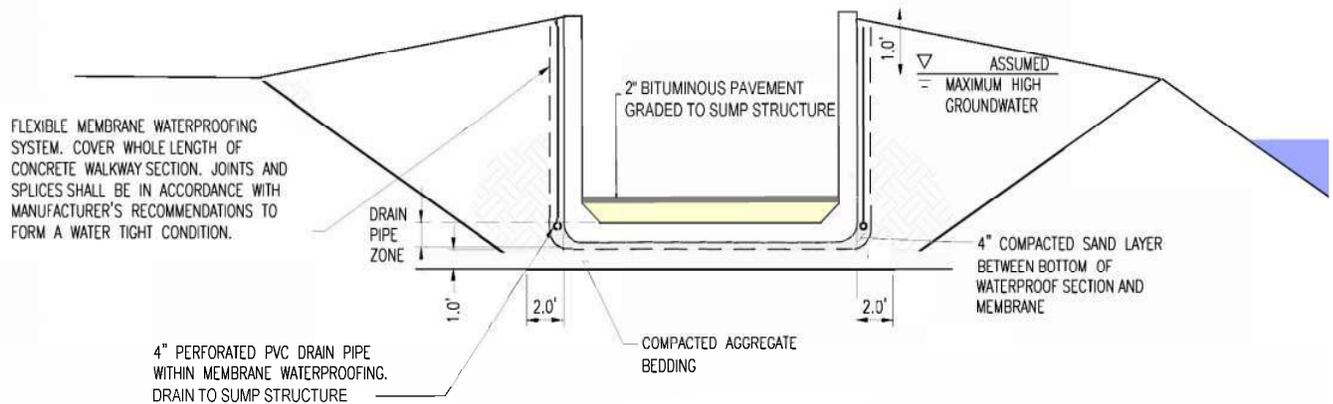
VE Proposed Depressed Trail Section Beneath I-95 with Waterproofing and Underdrainage System
